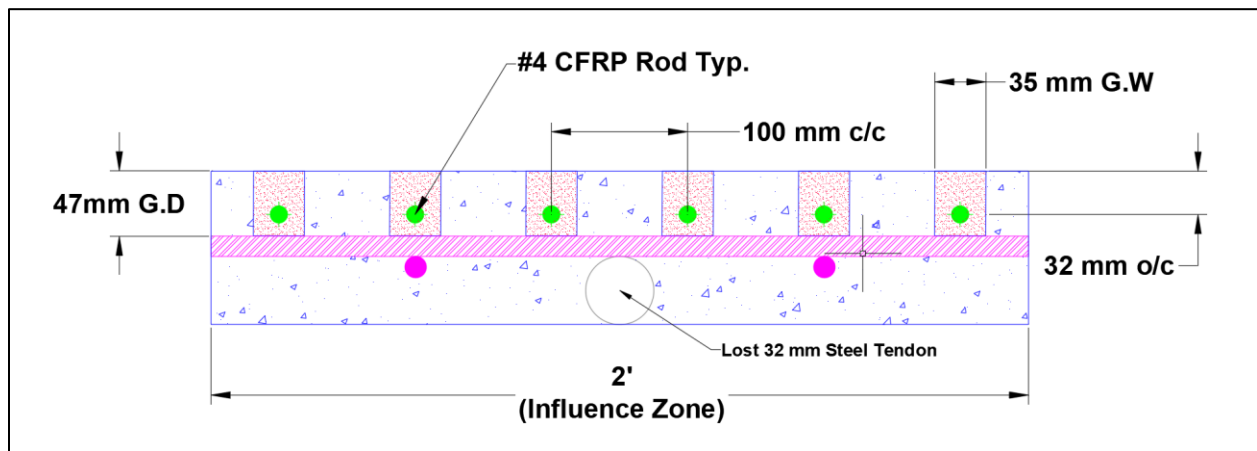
Existing Bridge Parametric Study CFRP NSM Detailing
